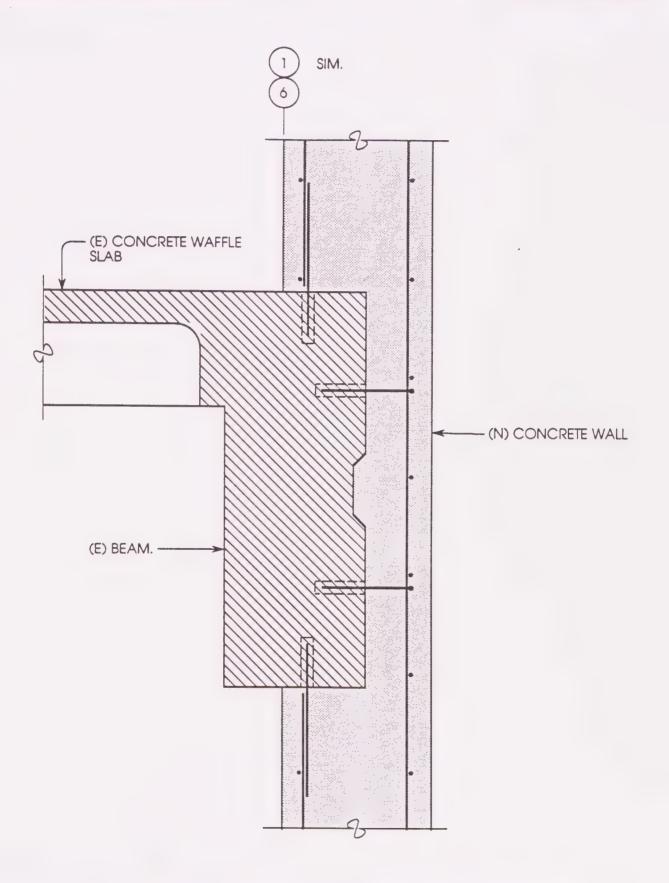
Retrofit Scheme - Typical Section thru Courthouse Wall
